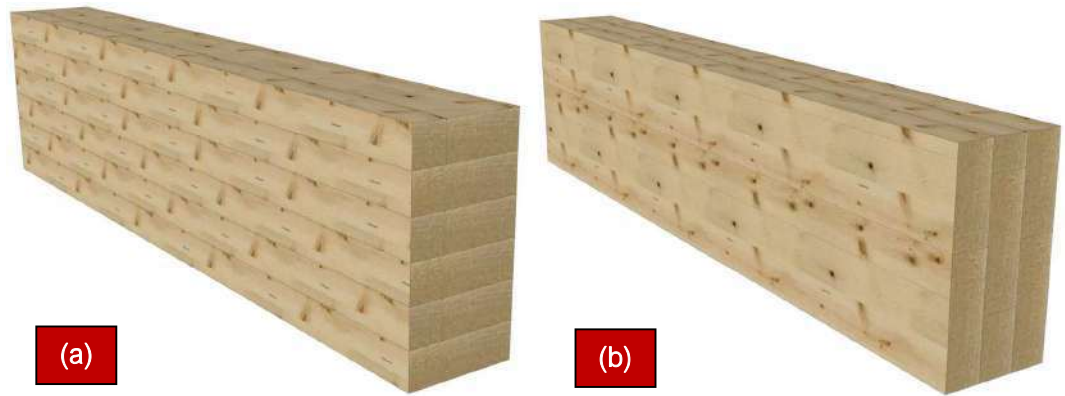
GLT 3D views; a) GLT horizontal brick layout; b) GLT vertical brick layout.
